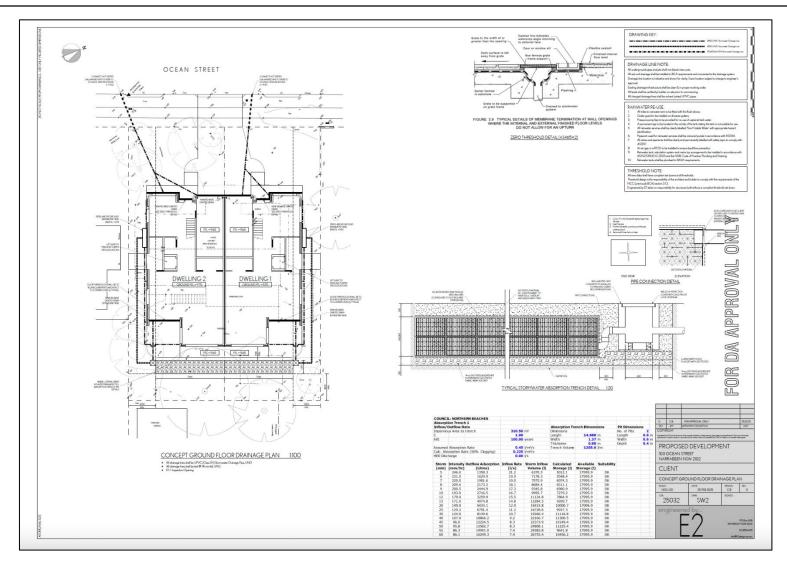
CONCEPT GROUND FLOOR DRAINAGE PLAN
